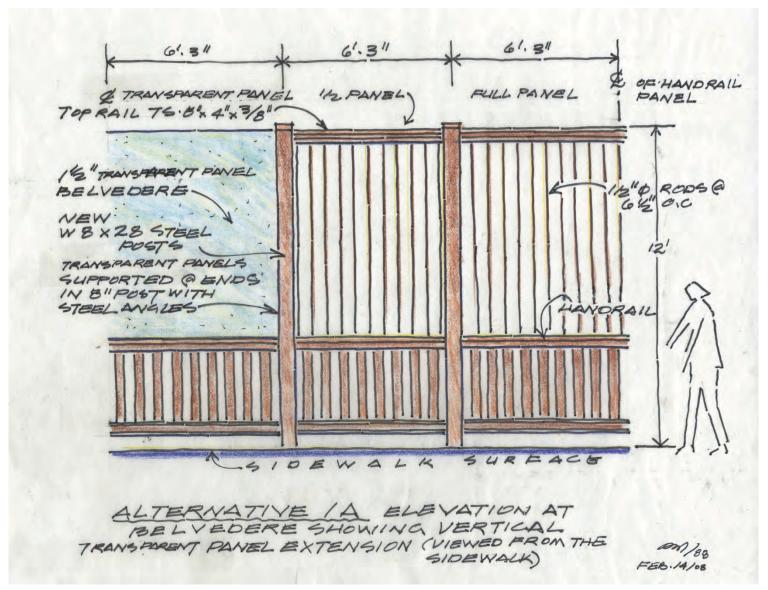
ALTERNATIVE 1A: ELEVATION AT BELVEDERE
